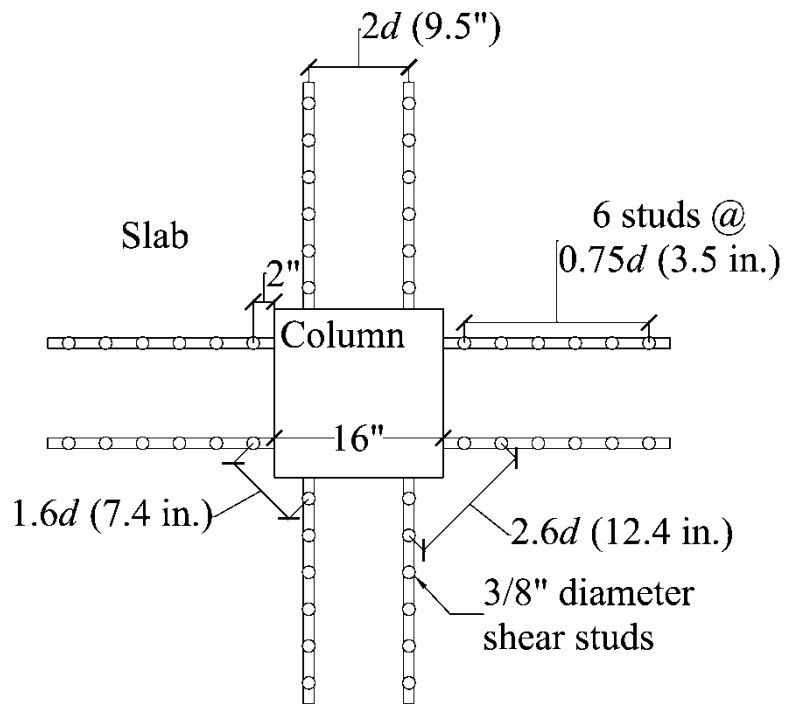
Shear Reinforcement Provided in a Previously Reported Shear Stud Reinforced Specimen (Cheng et al. 2009)
